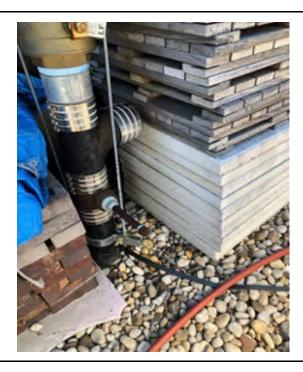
V5 riser and sample port in good condition, facing southeast. 8 April 2021.
